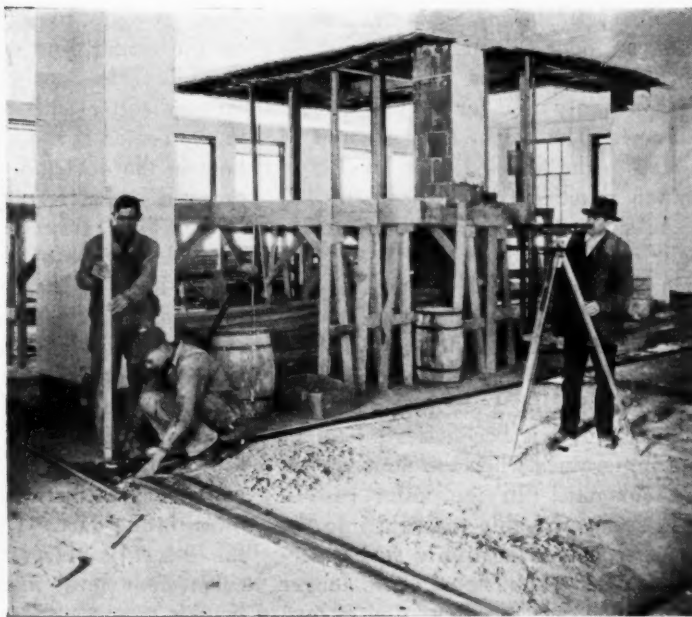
(left)—Square Duct Installation with Conduit Laterals Prior to Pouring Concrete Fill
